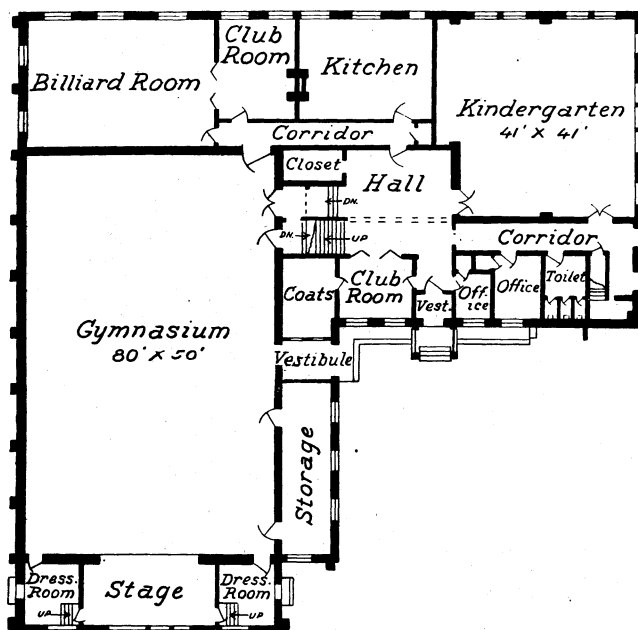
First-floor plan, Winnetka building. (By courtesy of A. S. Coffin, architect.)
